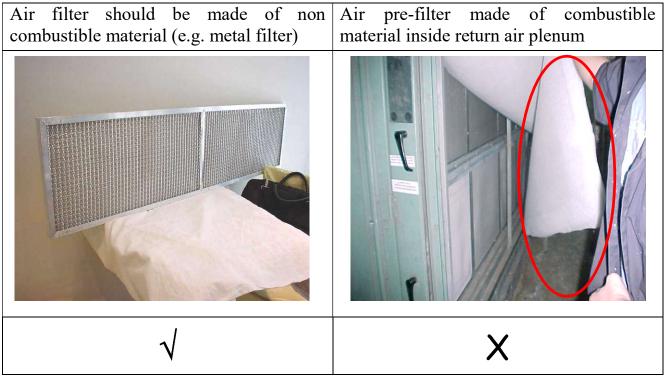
Combustible materials inside air stream (Combustible Air Filter)
